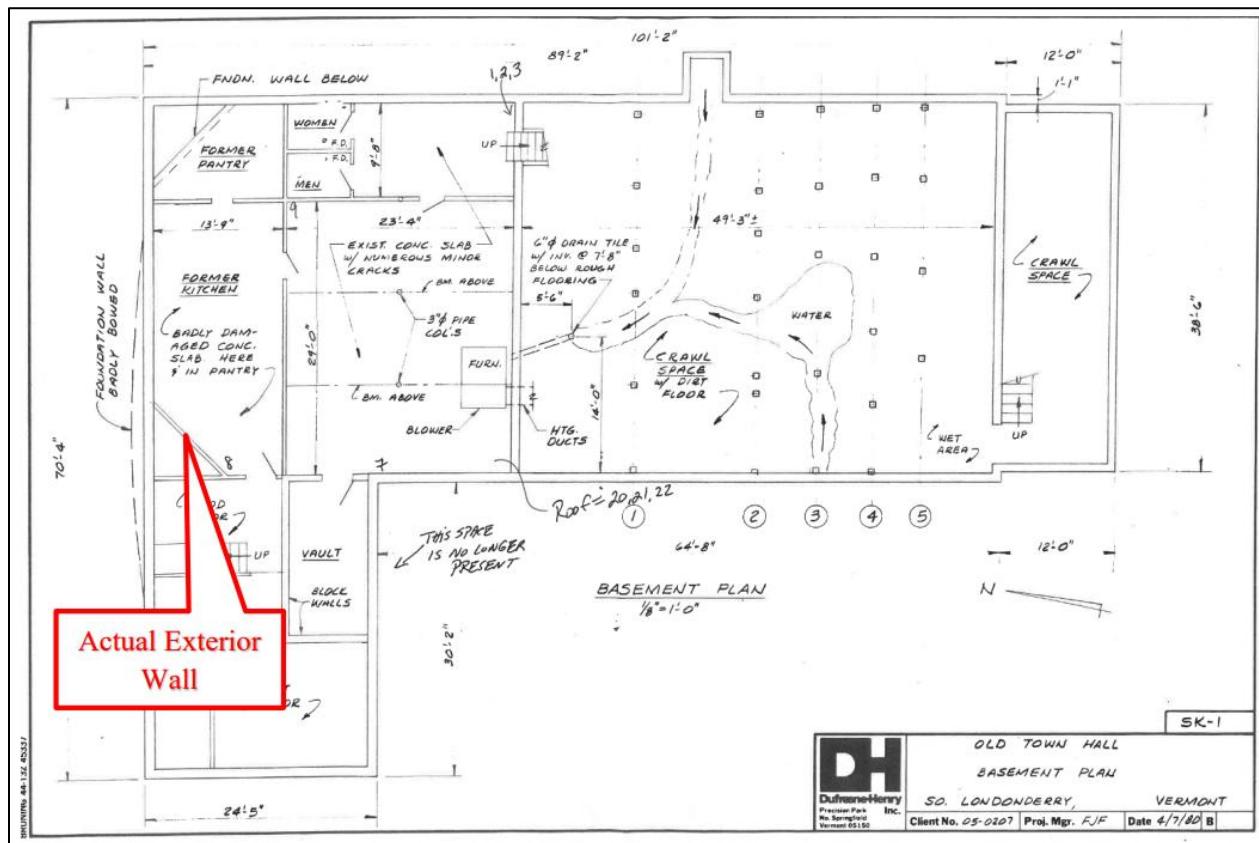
Londonderry Town Hall Basement Floor Plan (1980)
